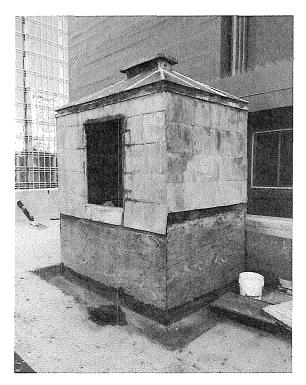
Photograph of elevator penthouse clad in metal panels over wood sheathing. Note surface corrosion on metal panels and missing access door (photograph taken on 02/27/2018)
